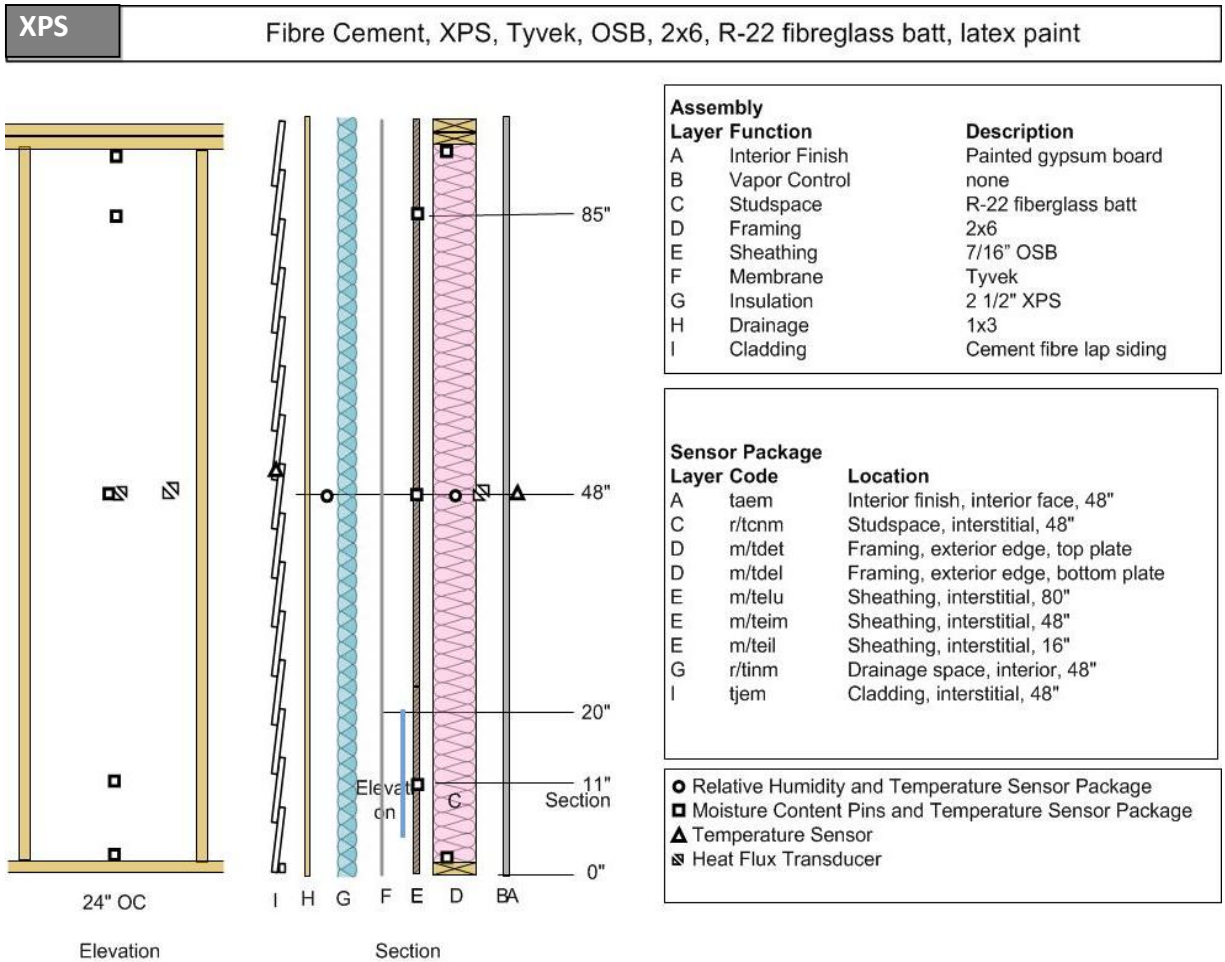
Elevation and exploded vertical cross-section of the center bay of the XPS wall panel
